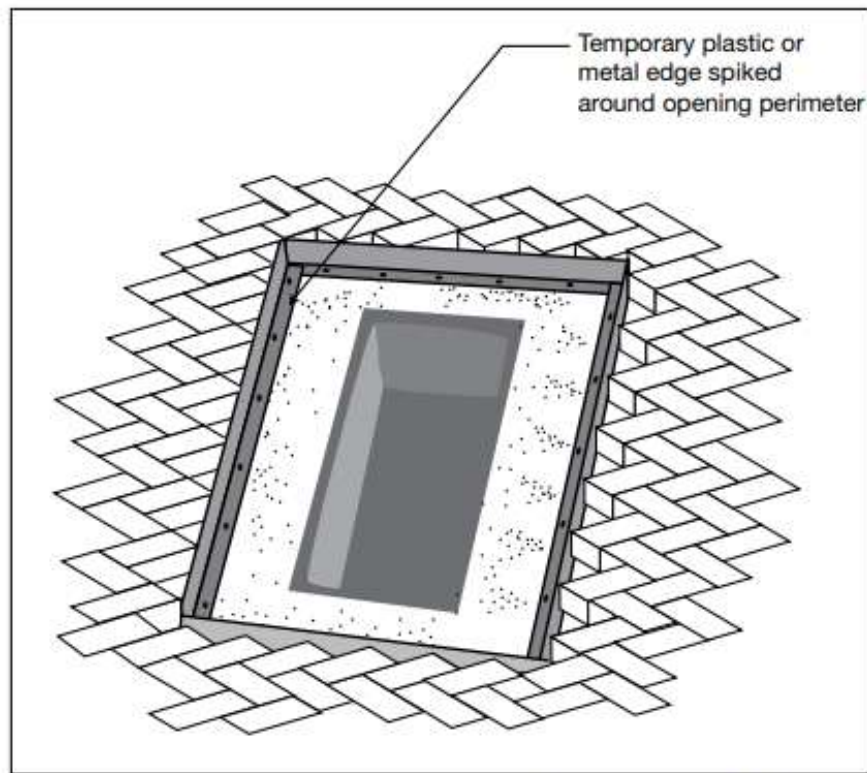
Temporary bracing at the pavement opening will help keep units in place during excavation, repairs and reinstatement.
